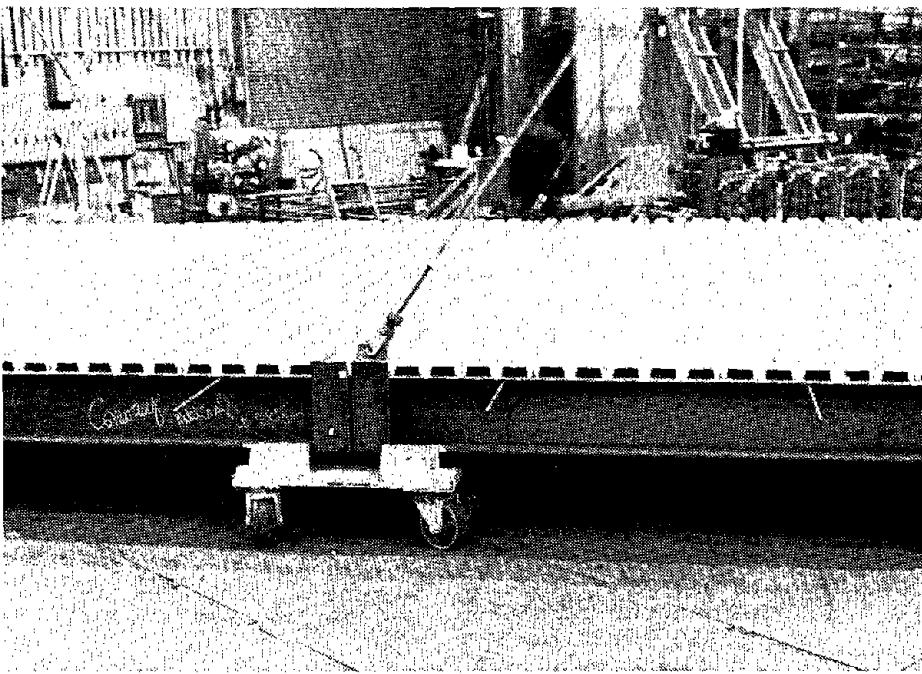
CABLE SLING ATTACHMENT TO LIFTING BAR.
